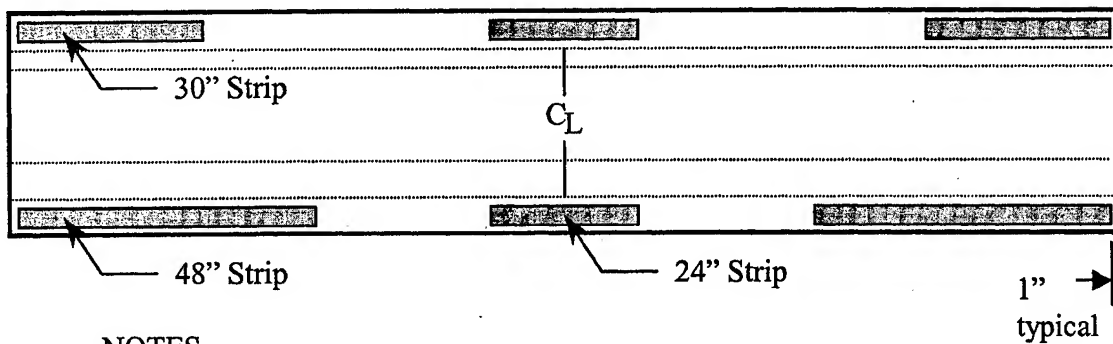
Diagram of DEMEC Embedment Strip Construction and Installation
